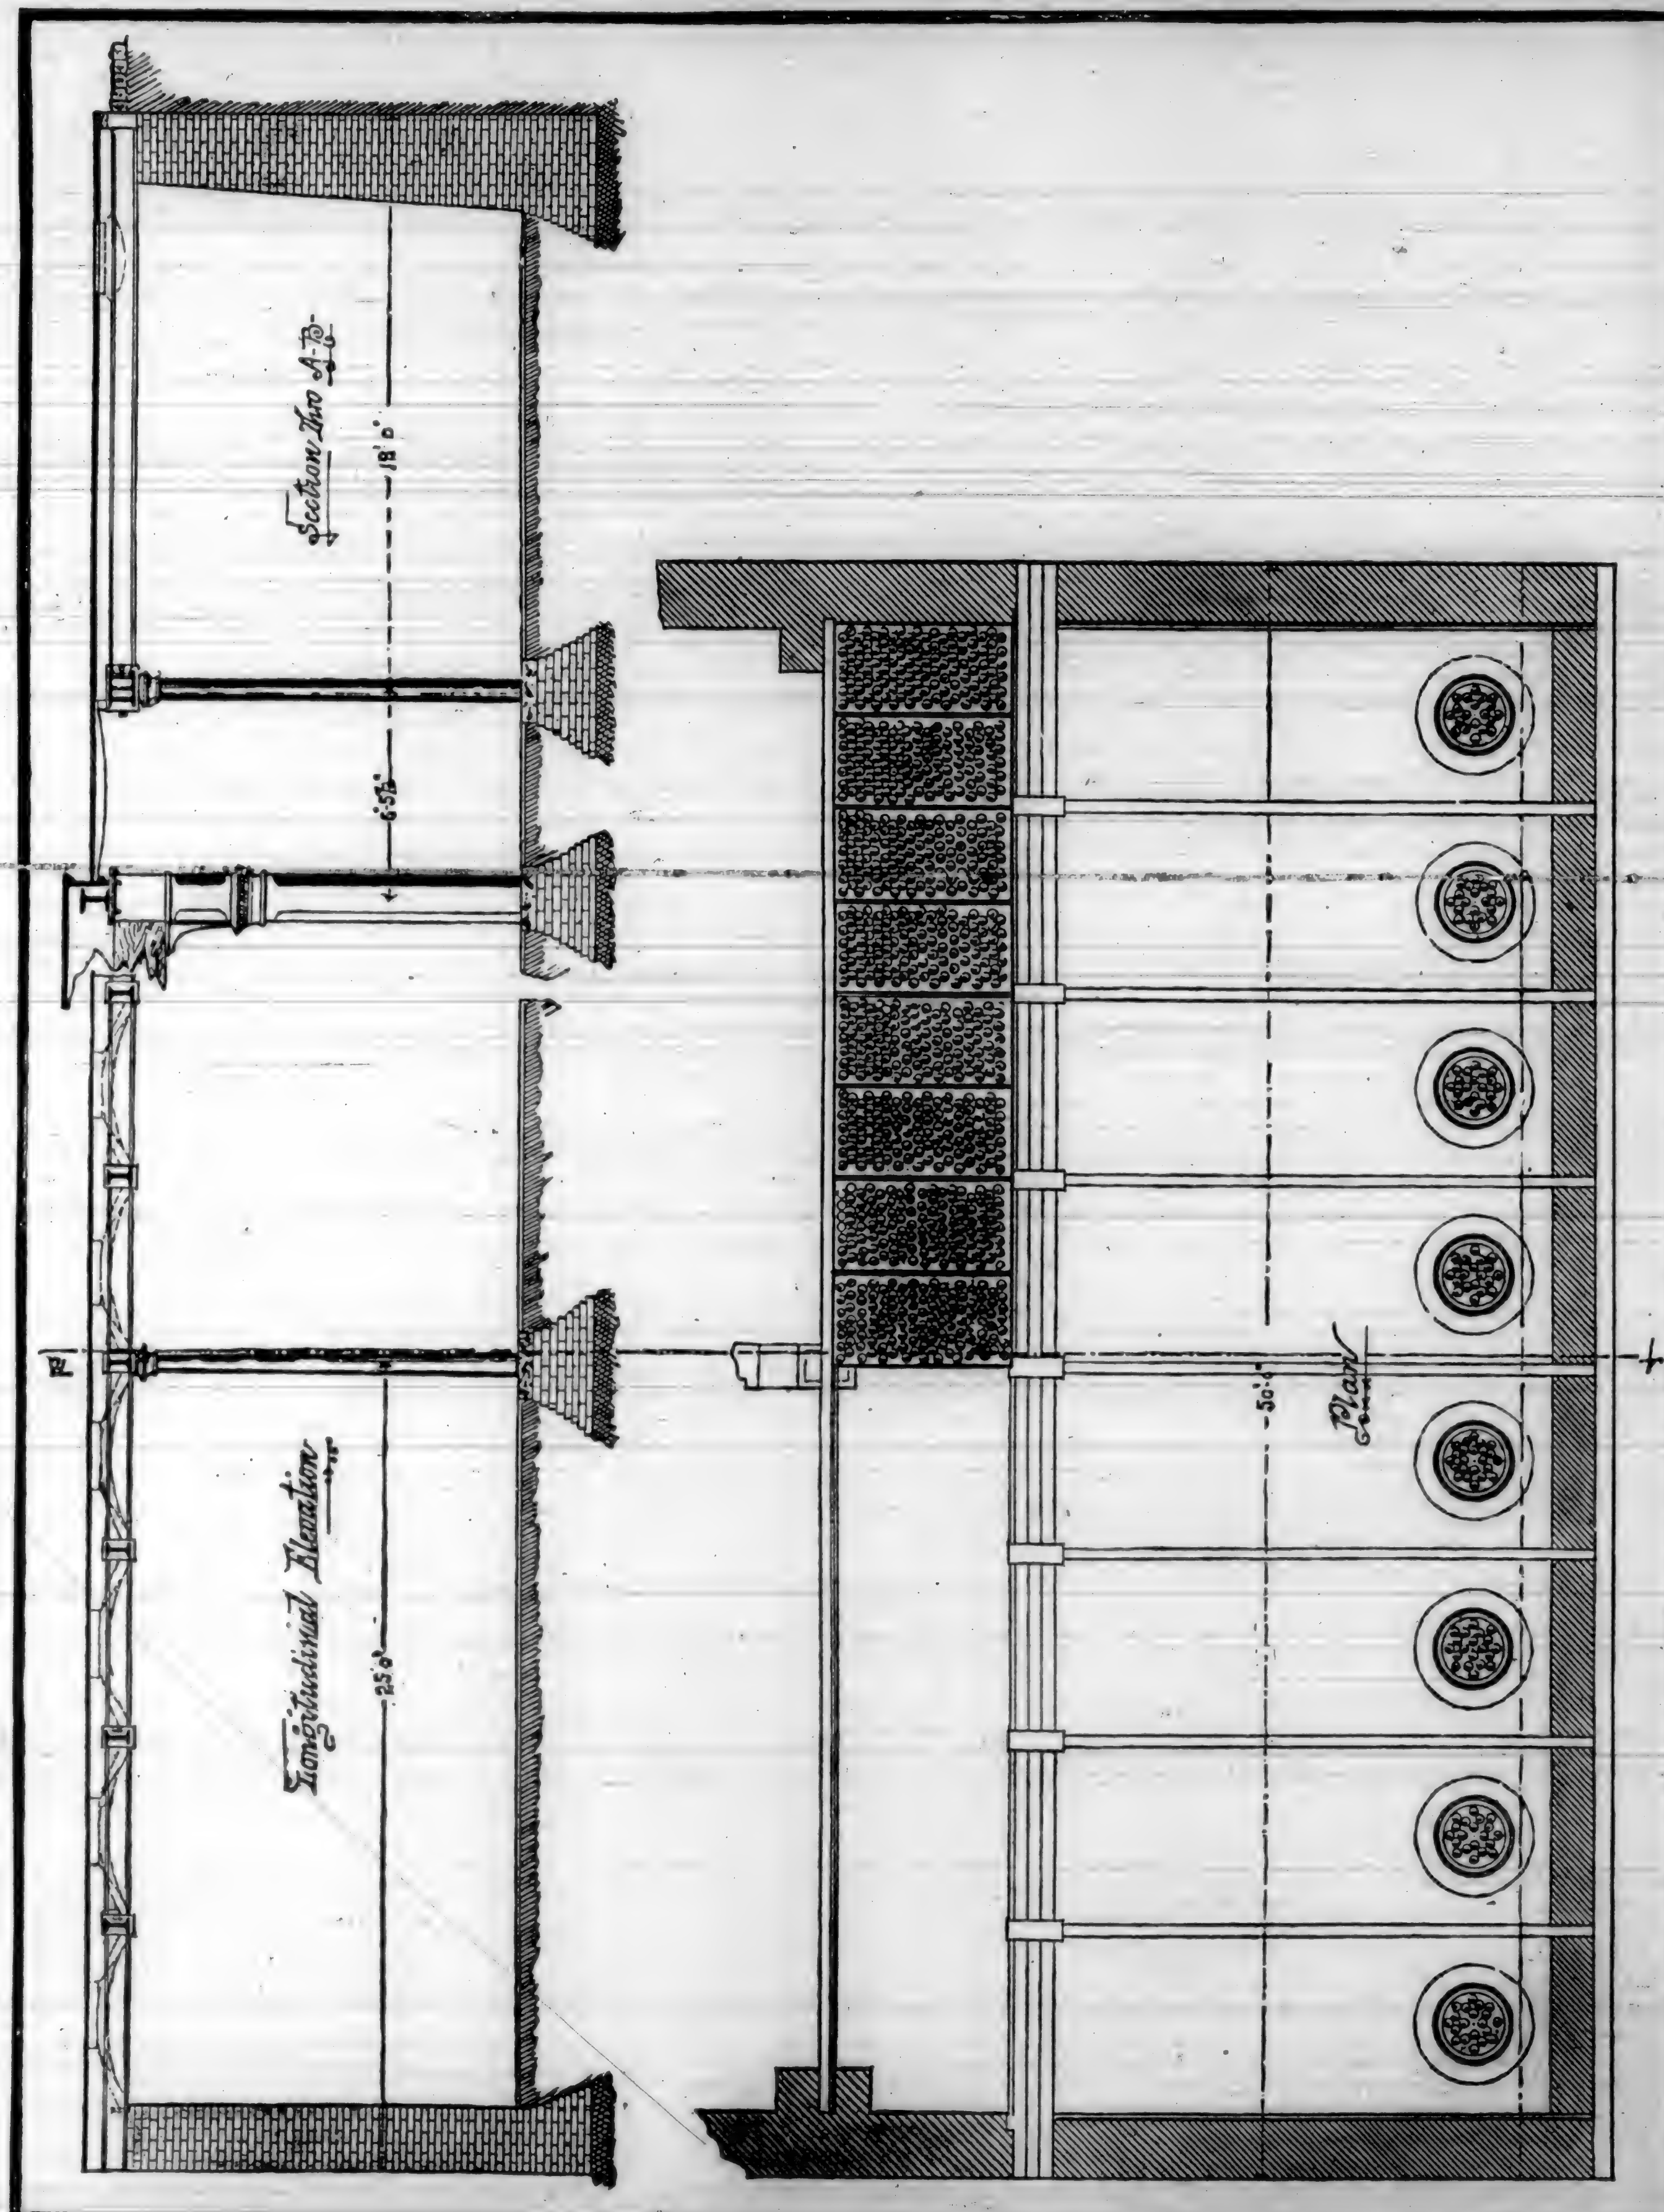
ELEVATIONS AND PLAN OF SIDEWALK OF BASEMENT EXTENSION. (See Page 50.)
